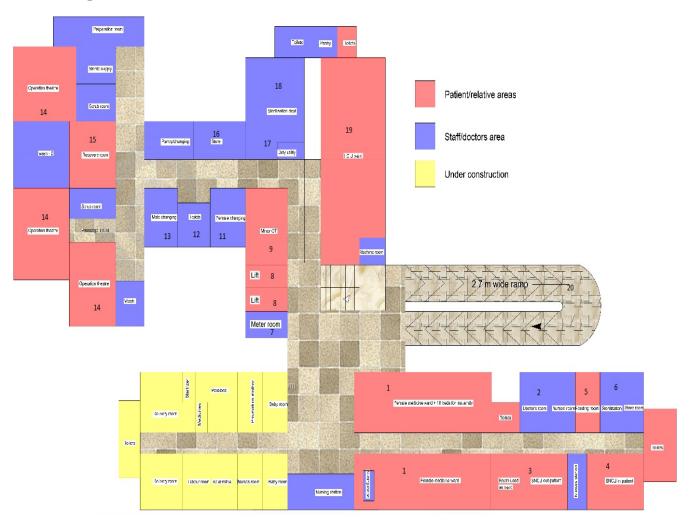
FIRST FLOOR PLAN IPD BUILDING (ALIBAG CIVIL HOSPITAL)
